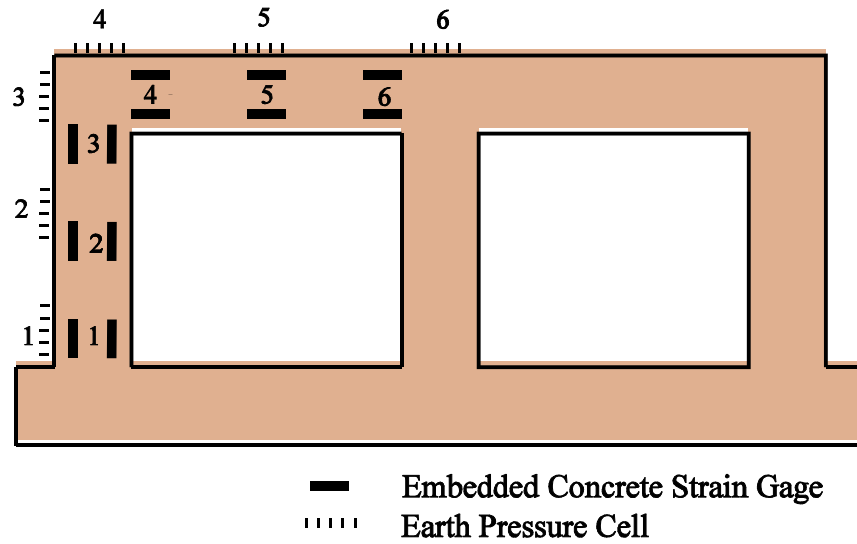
Typical Culvert Instrumentation Layout and Numbering Scheme
